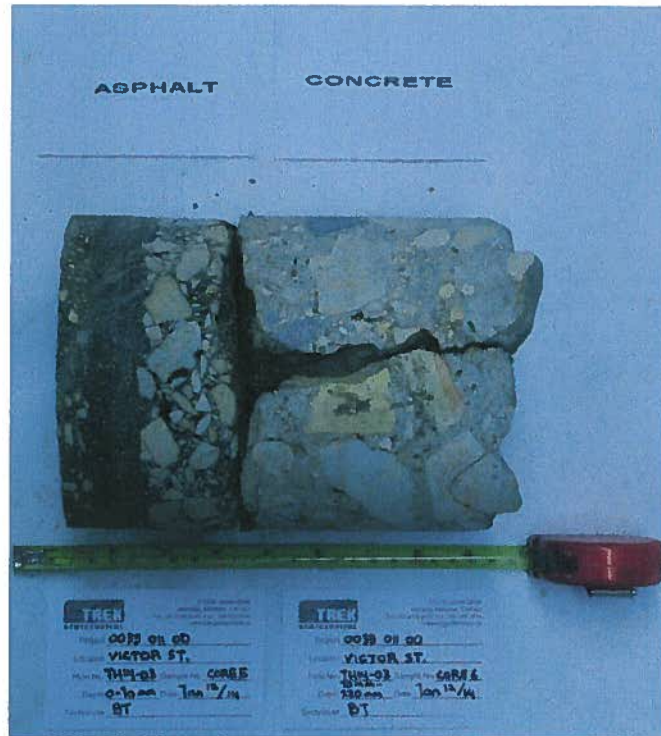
Asphalt and Concrete Core Sample from Test Hole TH14-03
